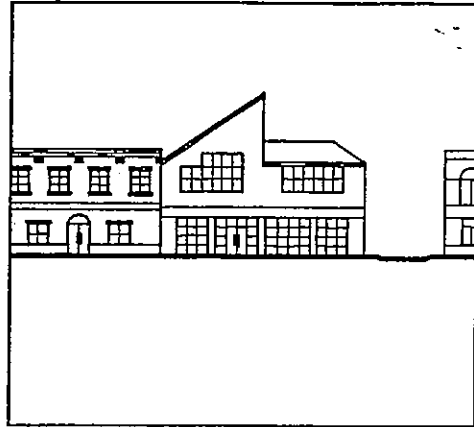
Roof types incompatible with adjacent roof types should be avoided.
